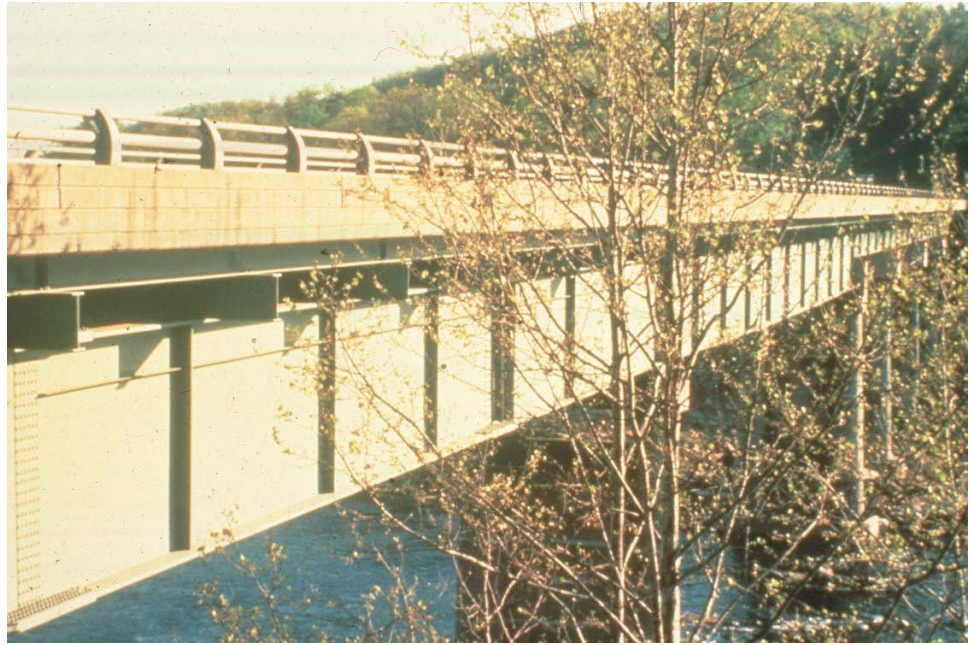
Two-Girder Bridge GFS System with Stacked Floorbeam and Stringers
